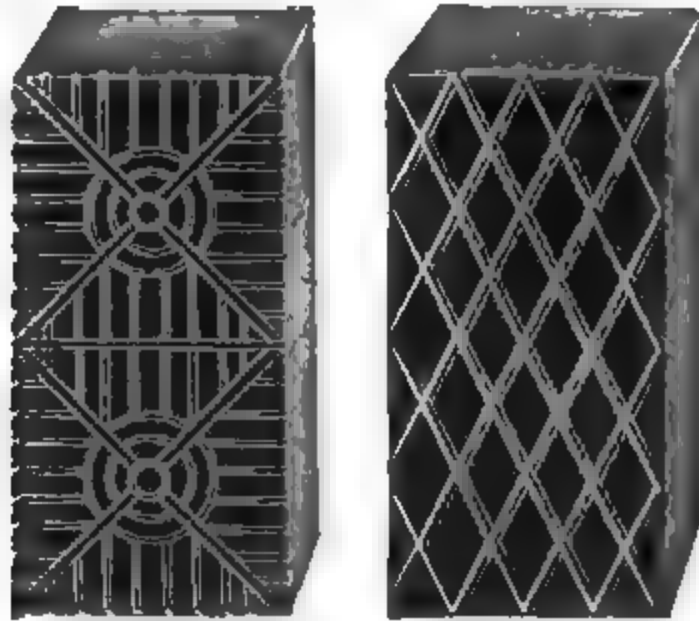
CORRUGATED SIDEWALK BRICK.
